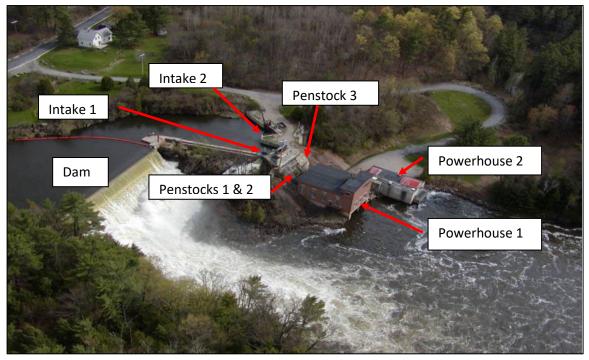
Huntington Falls Intakes, Penstocks and Powerhouses
